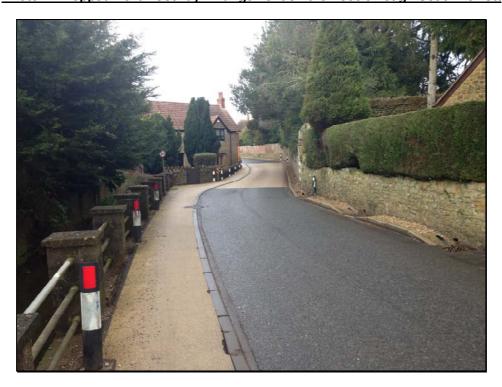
Dropped Kerb Footway Arrangement on the A356 through South Perrott
